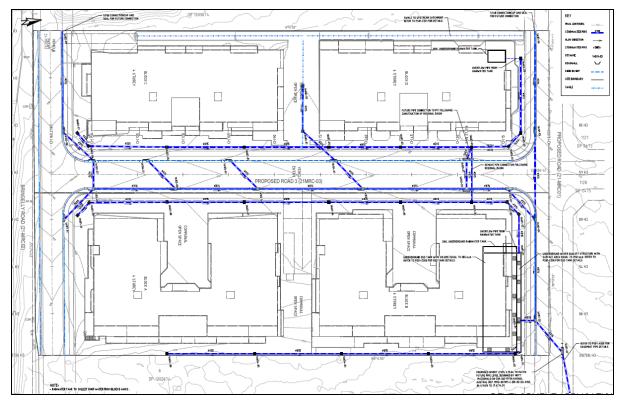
Stormwater Infrastructure proposed on-site and on an adjoining site
